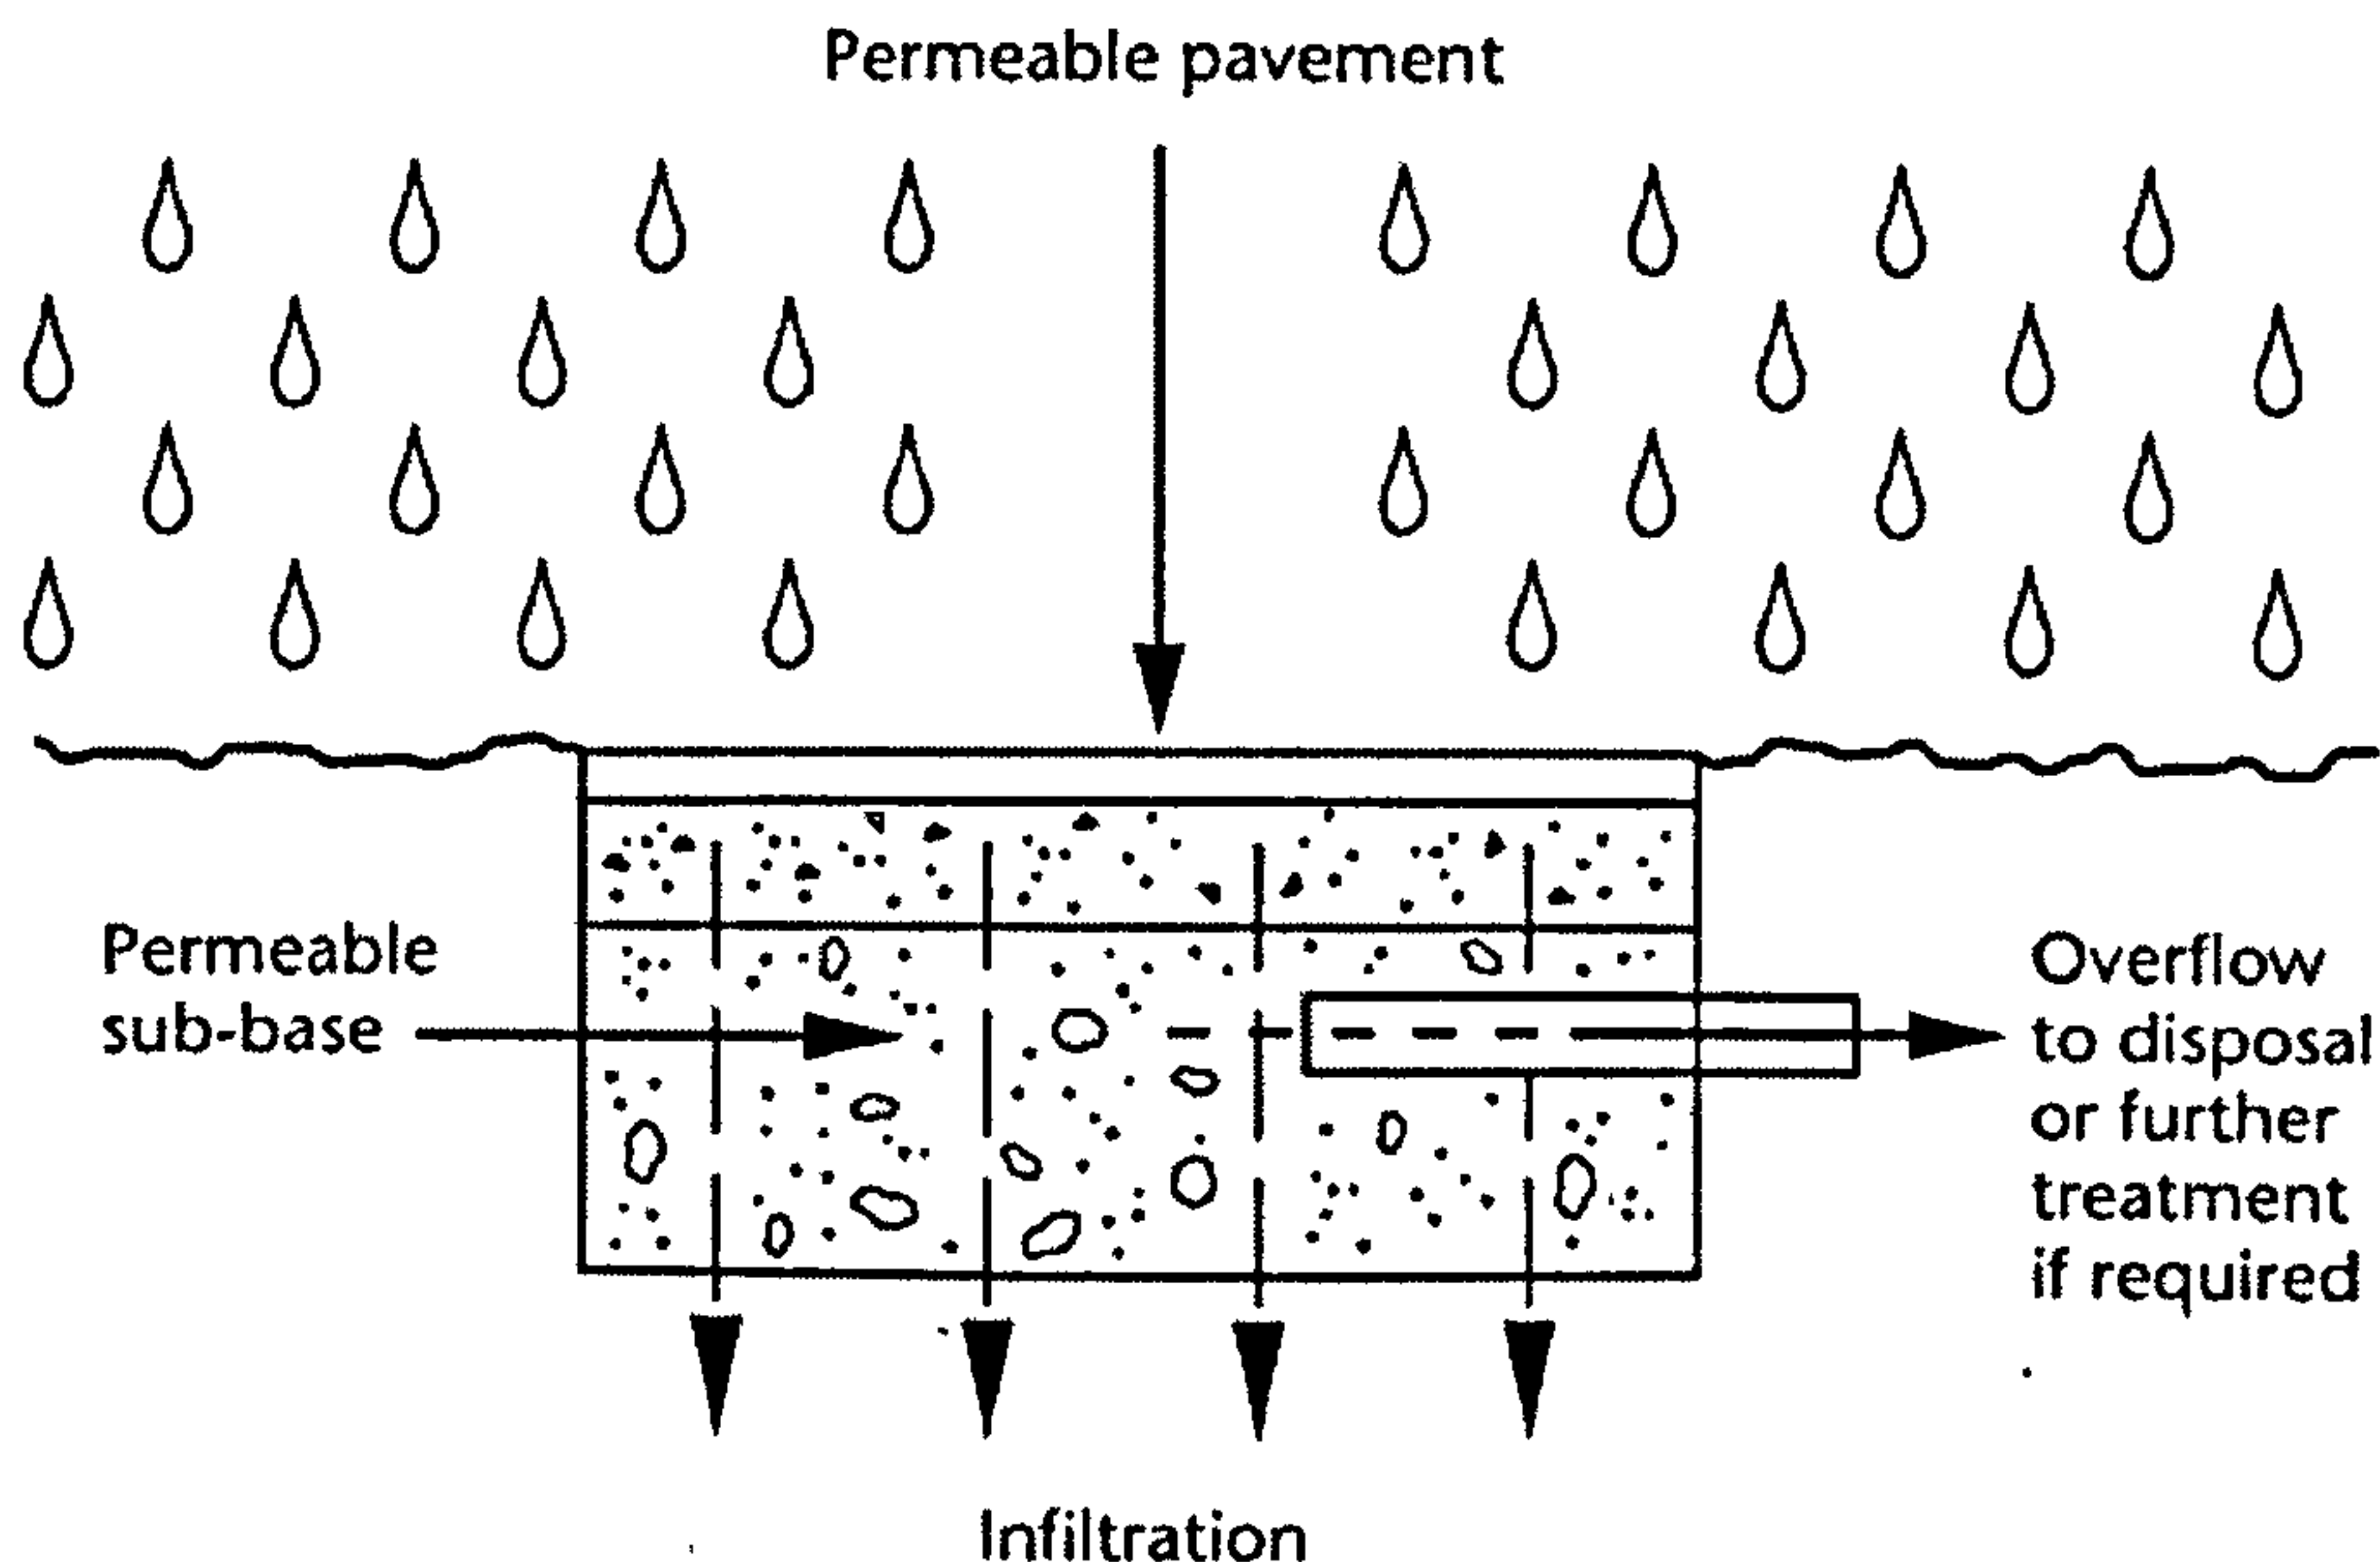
Cross section through permeable paving layers and sublayers [EA, 2004].
